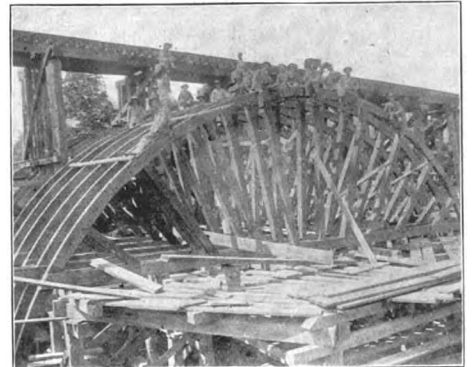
CENTERING FOR 60-FT. CONCRETE ARCH BRIDGE NEAR BRIGHTON.
